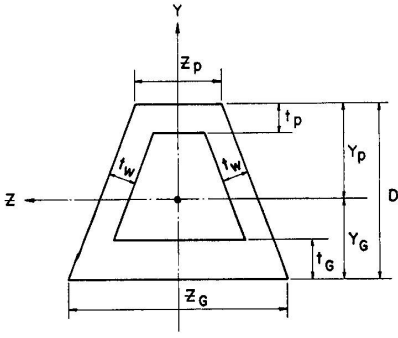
DETAILS OF COLUMN CROSS-SECTION
